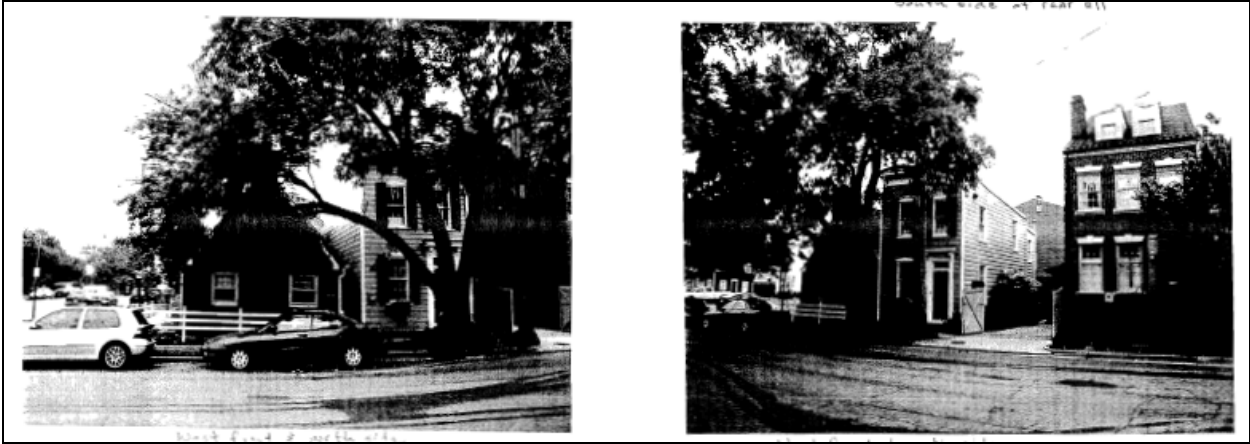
Views of front (west) elevation and side (south) elevation from South Fairfax Street.
